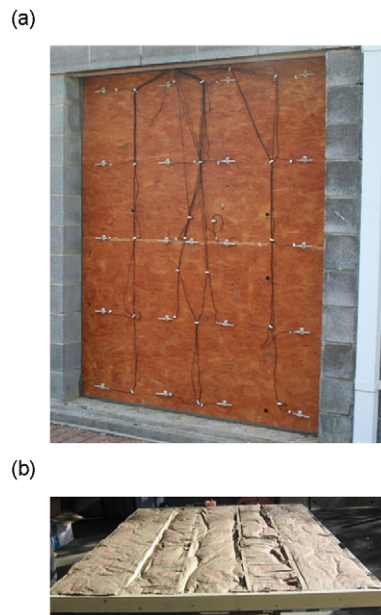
(a) Plaster-wood wall instrumented with microphones and installed in the cinderblock room and (b) wall frame with insulation.
